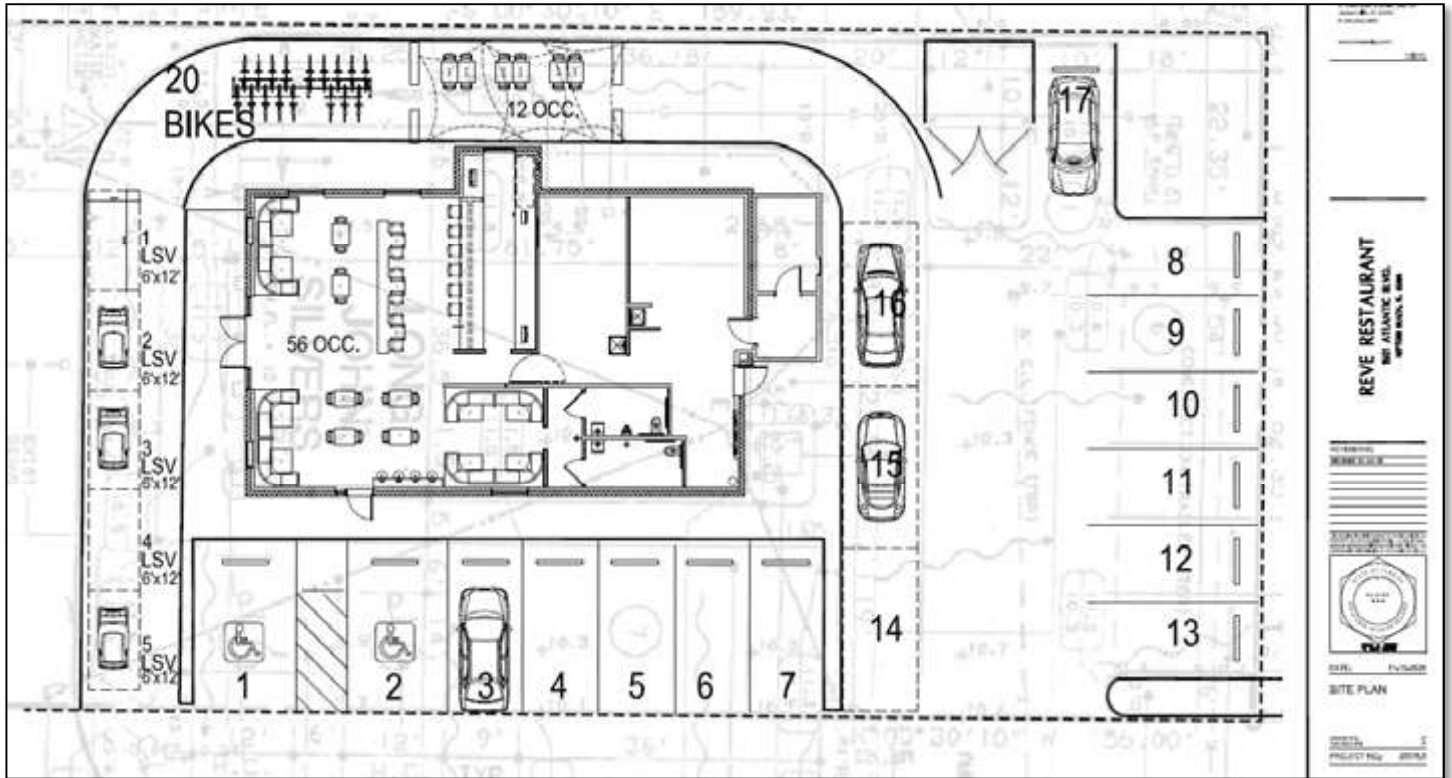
Preliminary Development Plan: Reve Brewing 1501 Atlantic Blvd
